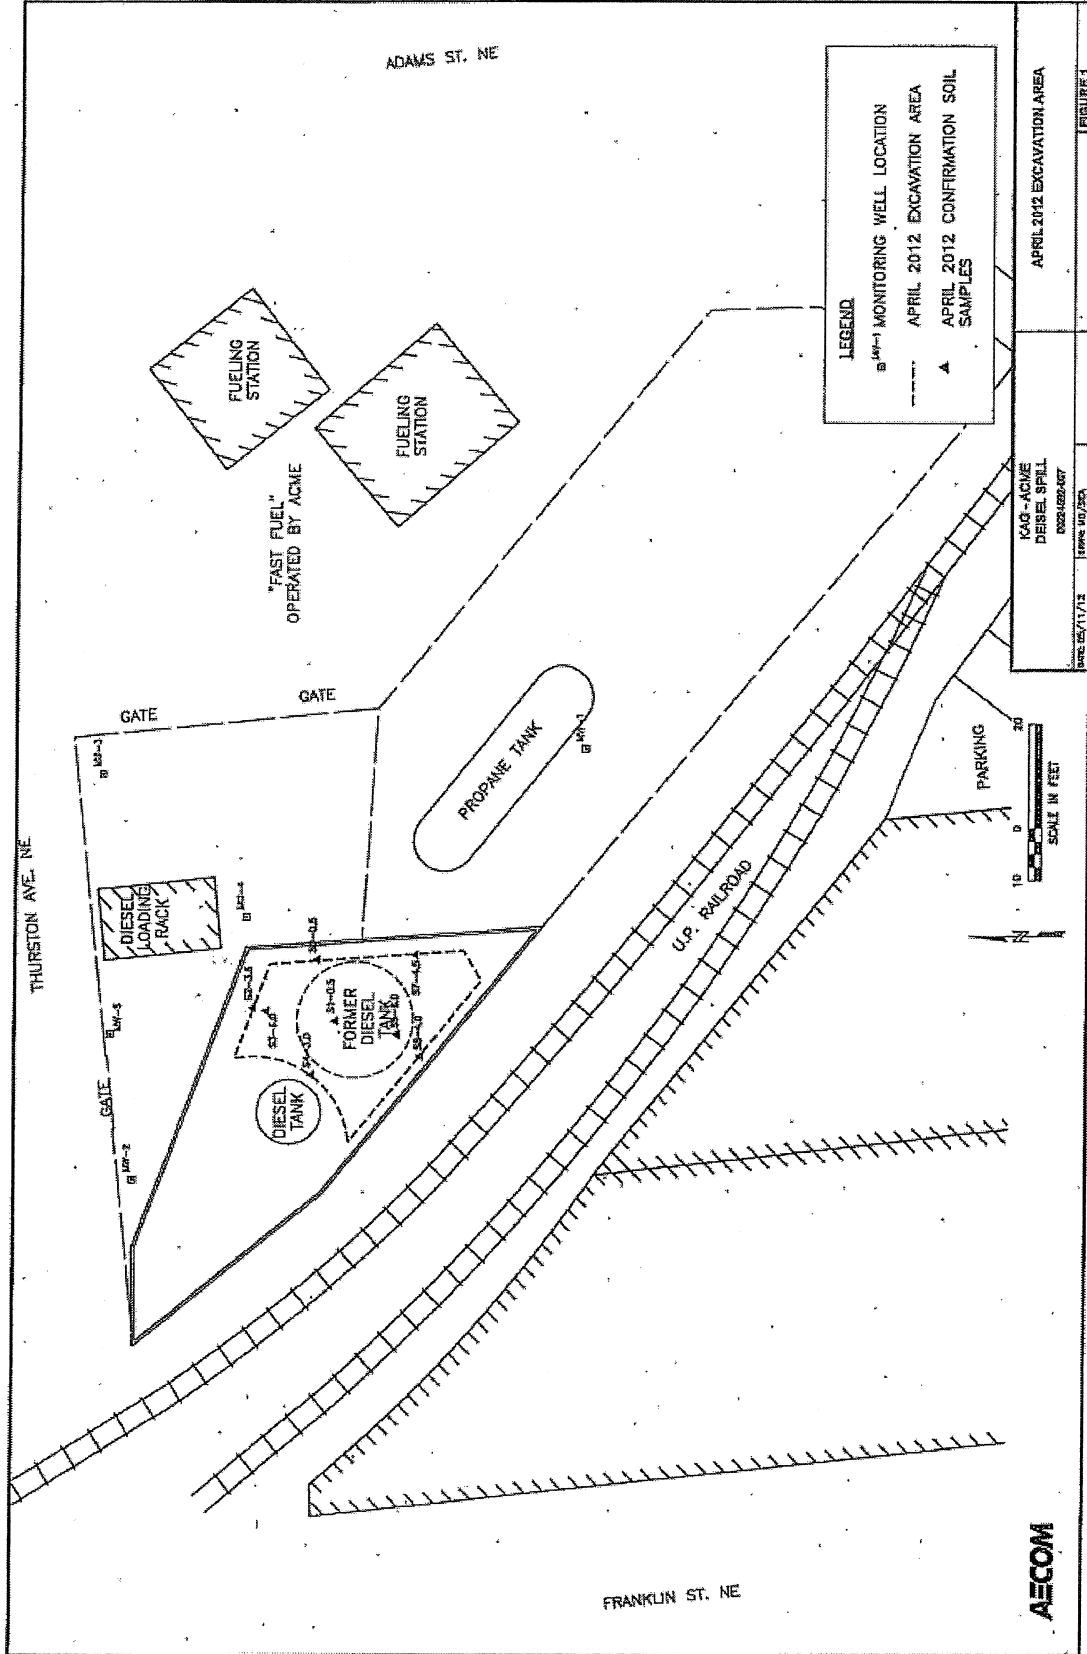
Soil Confirmation sample locations and Soil Excavation Extent around Former Spilled Aboveground Storage Tank (Courtesy of AECOM)
